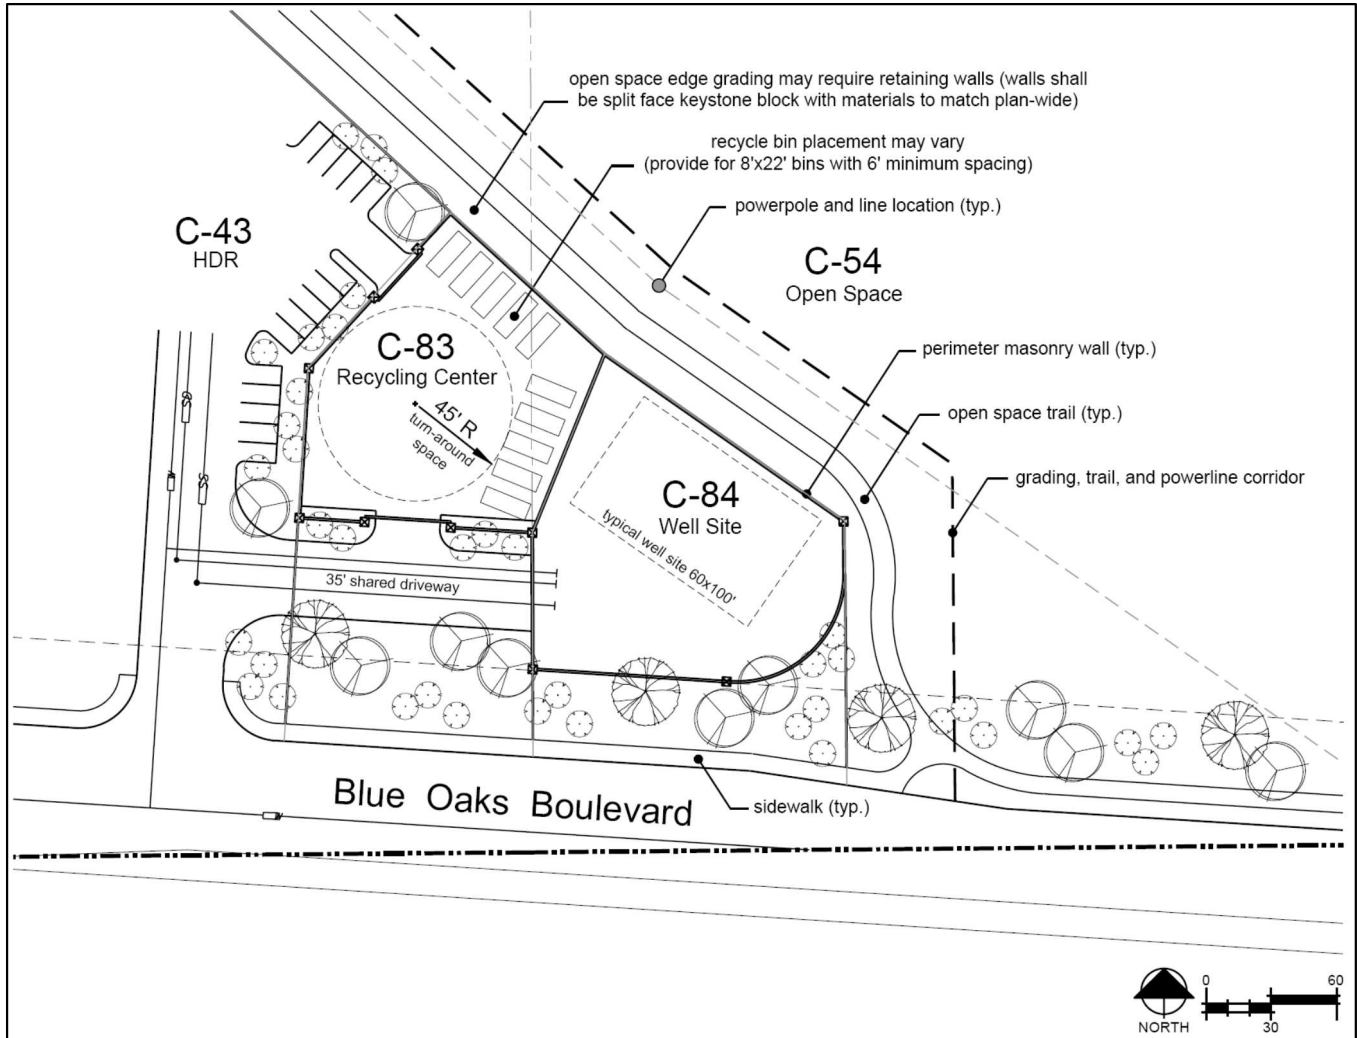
Recycling Center (Parcel C-83) and Well Site (Parcel C-84) Concept Plan
